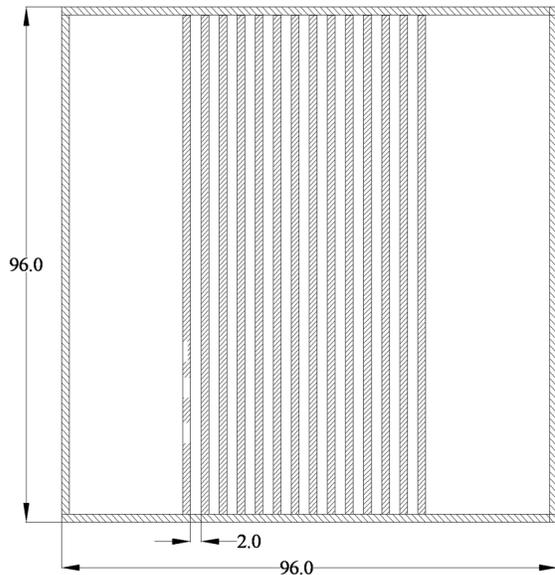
Schematic of distributed studs with 2 in. (5.1 cm) gaps and a 27% framing factor at the 8×8 ft (2.44×2.44 m) wall.
